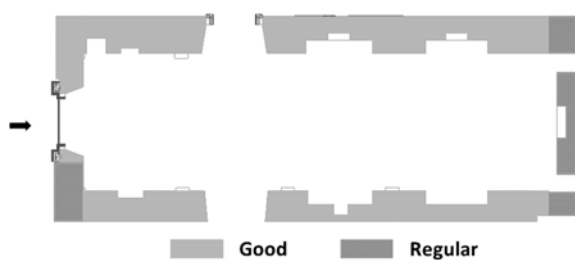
Layout of the state of conservation of the walls of the Loreto chapel
